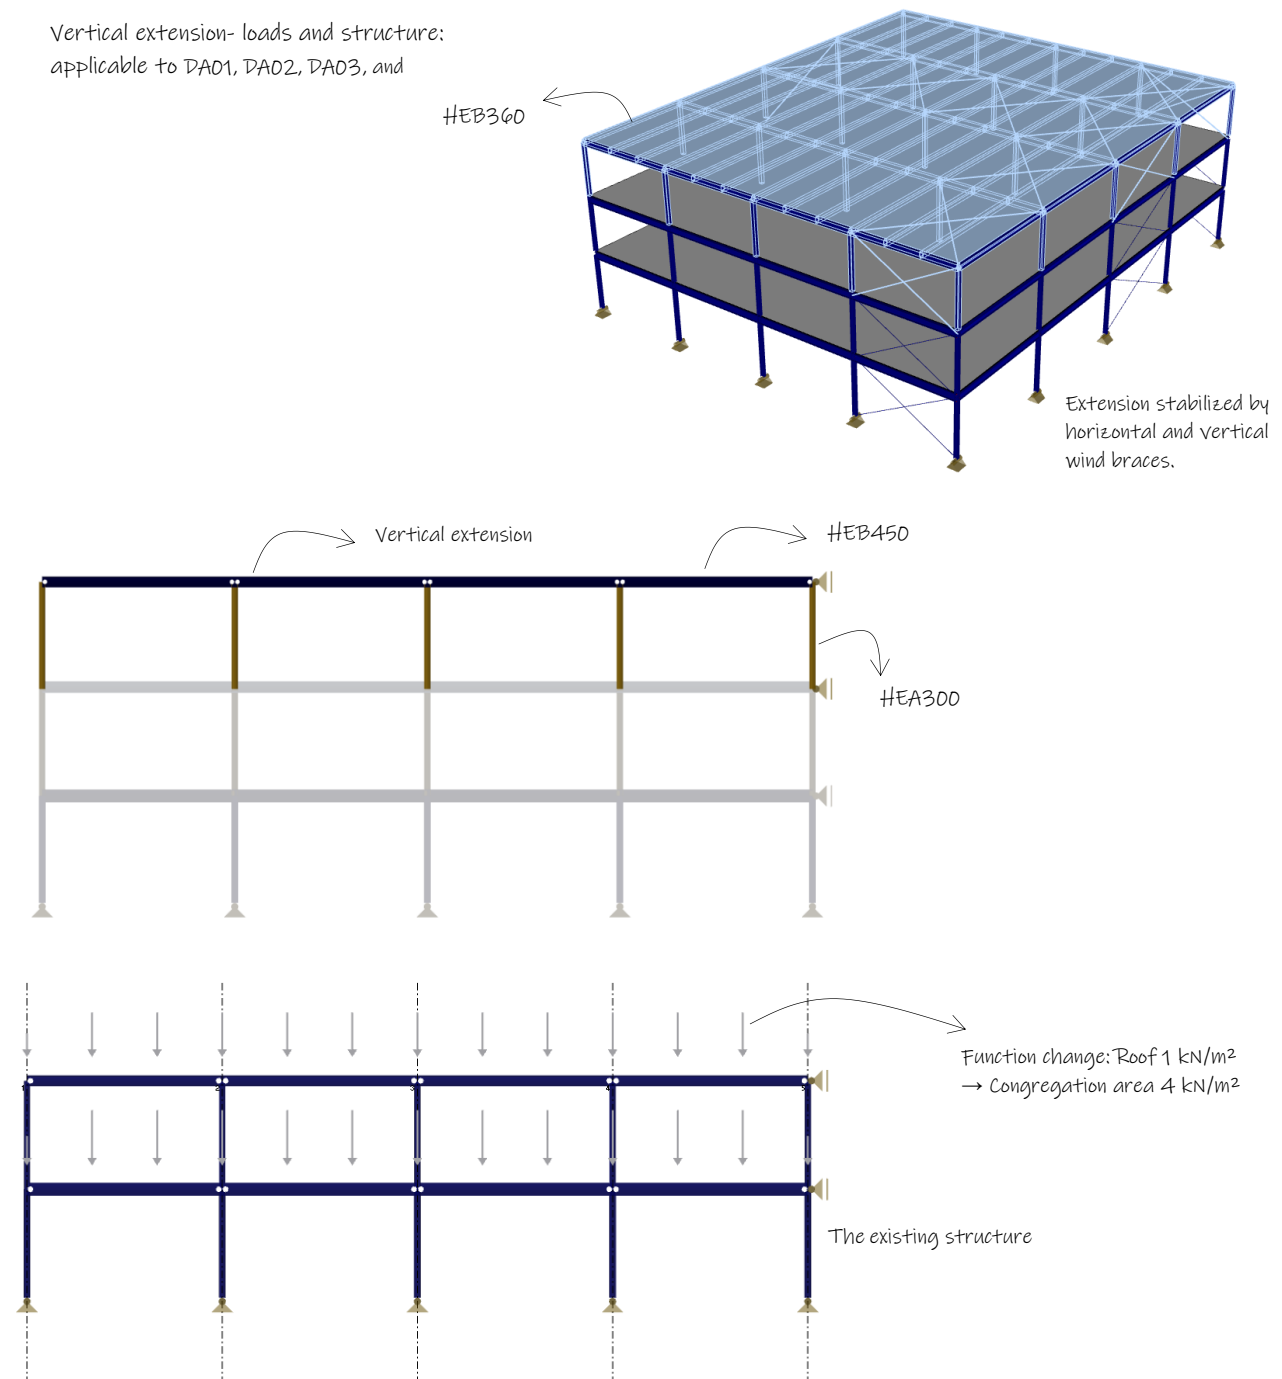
Vertical extension conceptual design, load changes and cross sections, applicable to DA01, DA02, DA03, and DA05.
